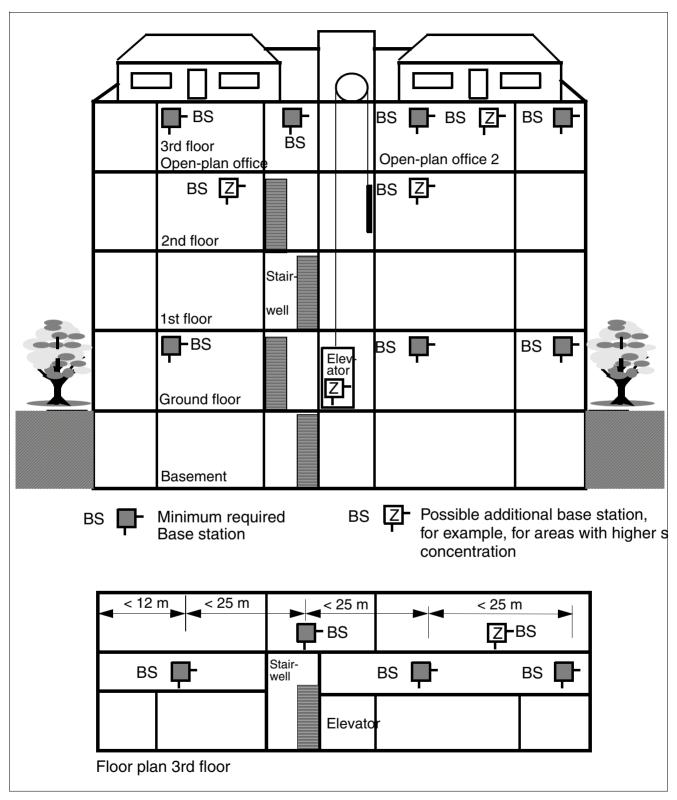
Base station distribution in interiors with concrete and steel dividing walls
